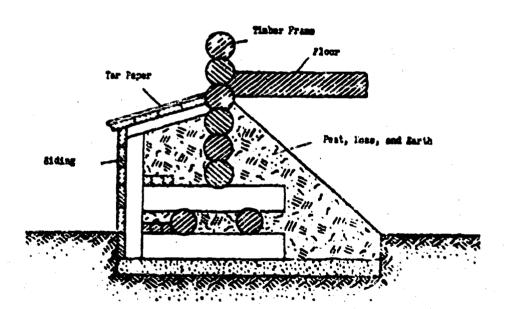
Wooden Building on Crib Foundation with Insulated Air Space
